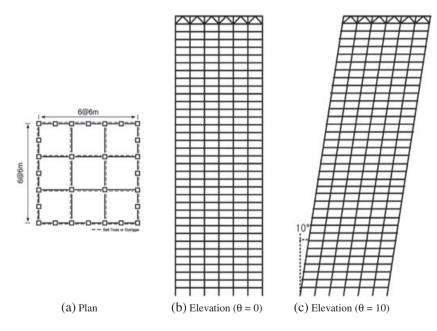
Thirty-six-story analysis model structures with outrigger and belt trusses.
